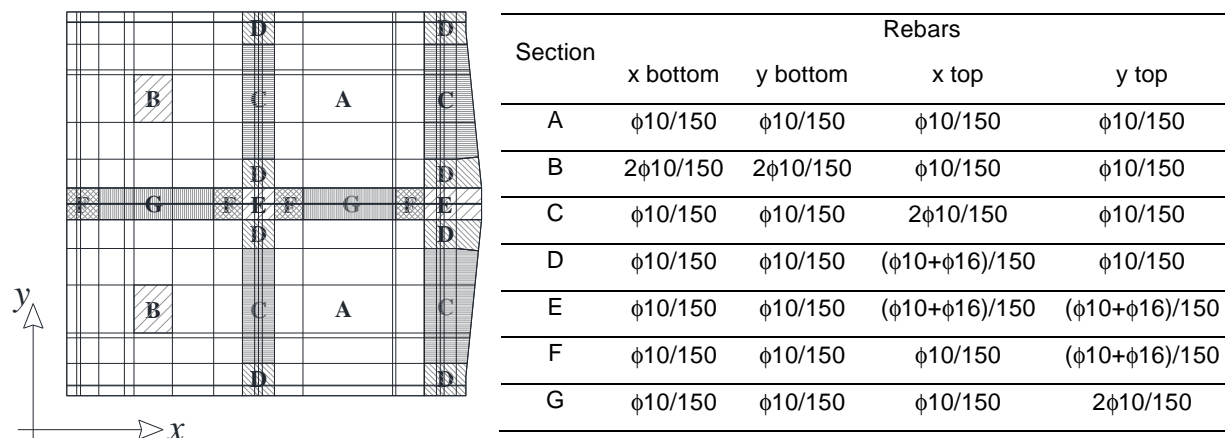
'Symmetric' structure. (a) Concrete slab partitions; (b) slab section properties (measures in mm)
